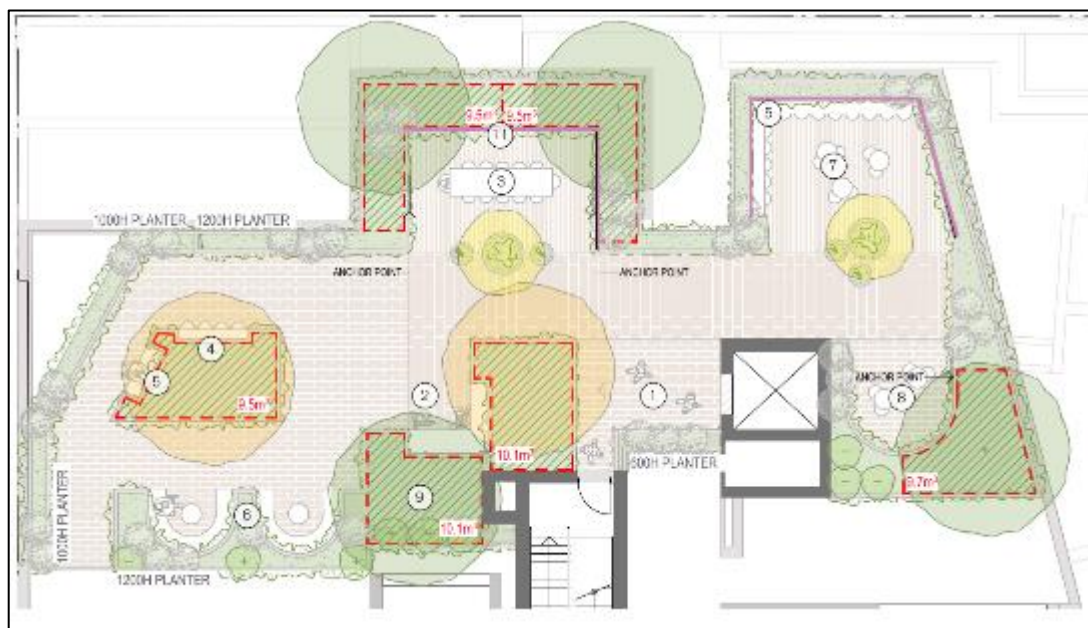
Rooftop landscaping as per the submitted Landscape Plans prepared by DKO Landscape
